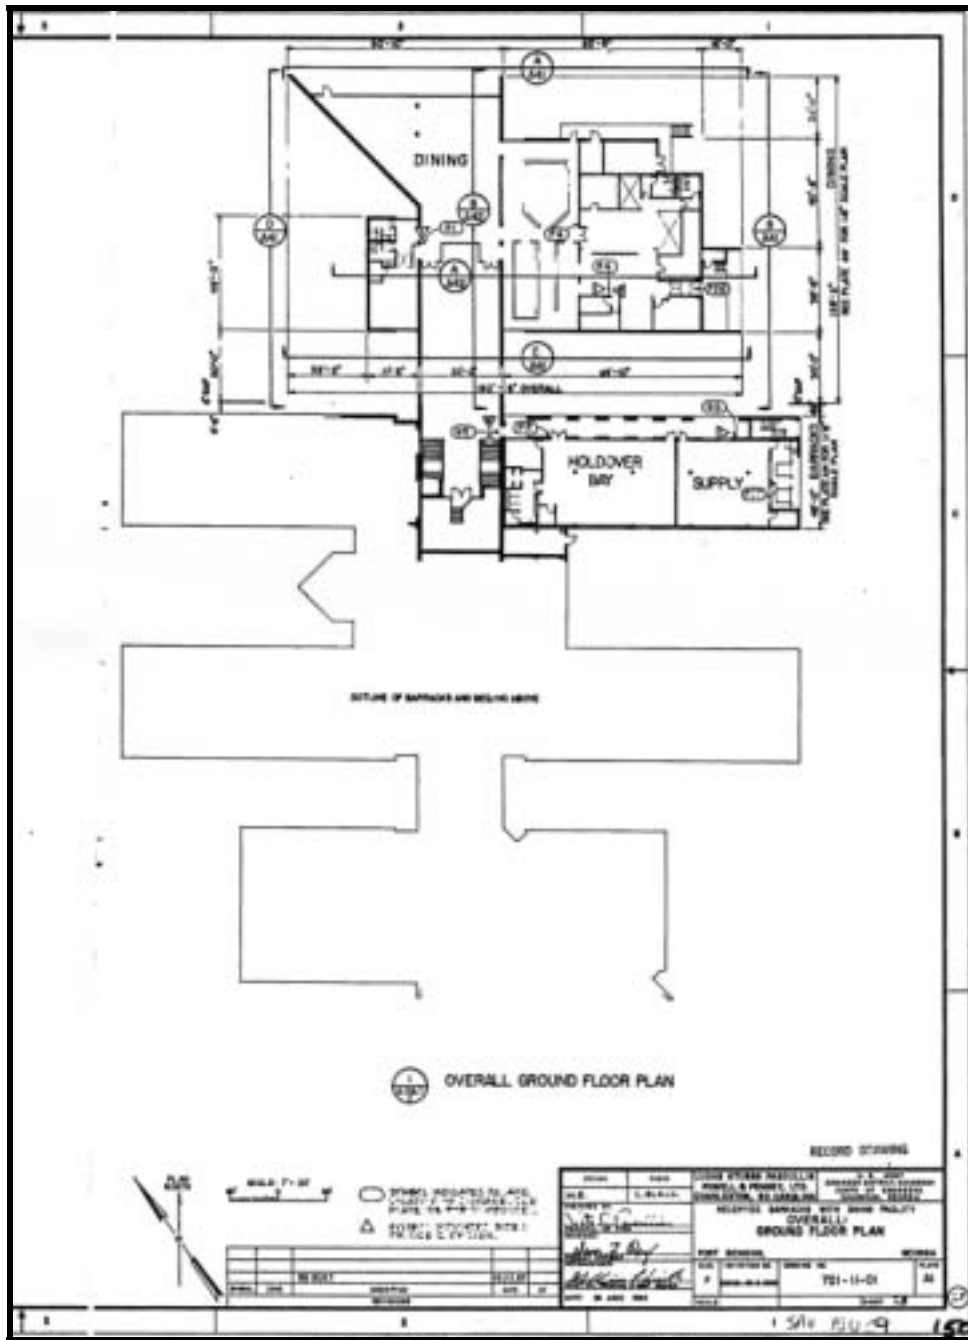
Receptee barracks, ground floor (1985, revised 1987) (Engineering, Ft. Benning).
